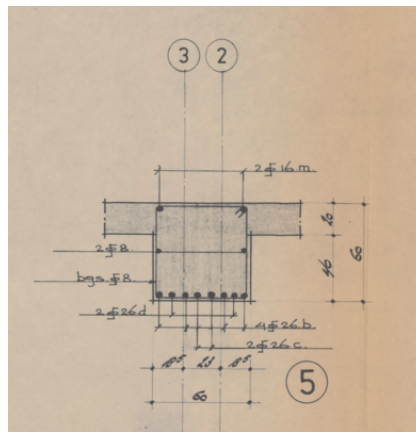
Cross-section moment-zero point in the beam of Munthof
